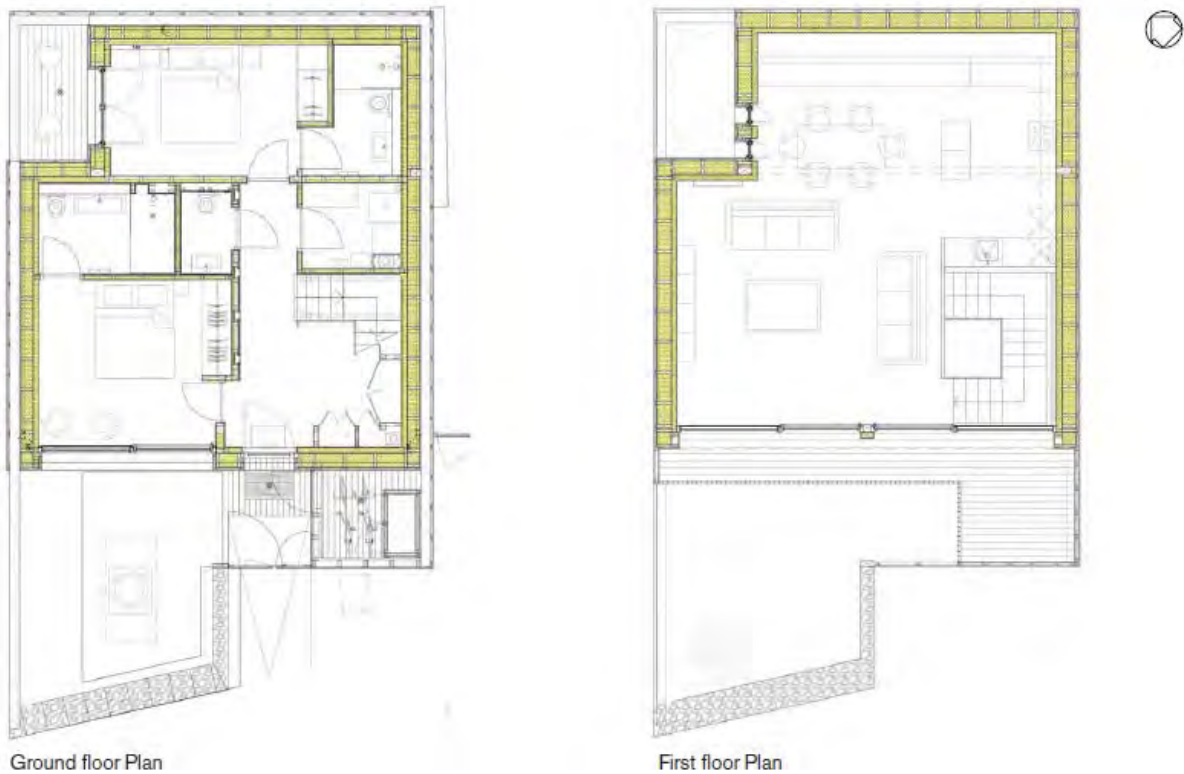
Camden Passive House floor plans. The ground floor is slightly sunk into the ground with concrete retaining walls on the boundaries to the back and sides of the building. The main glazing faces southwest.
